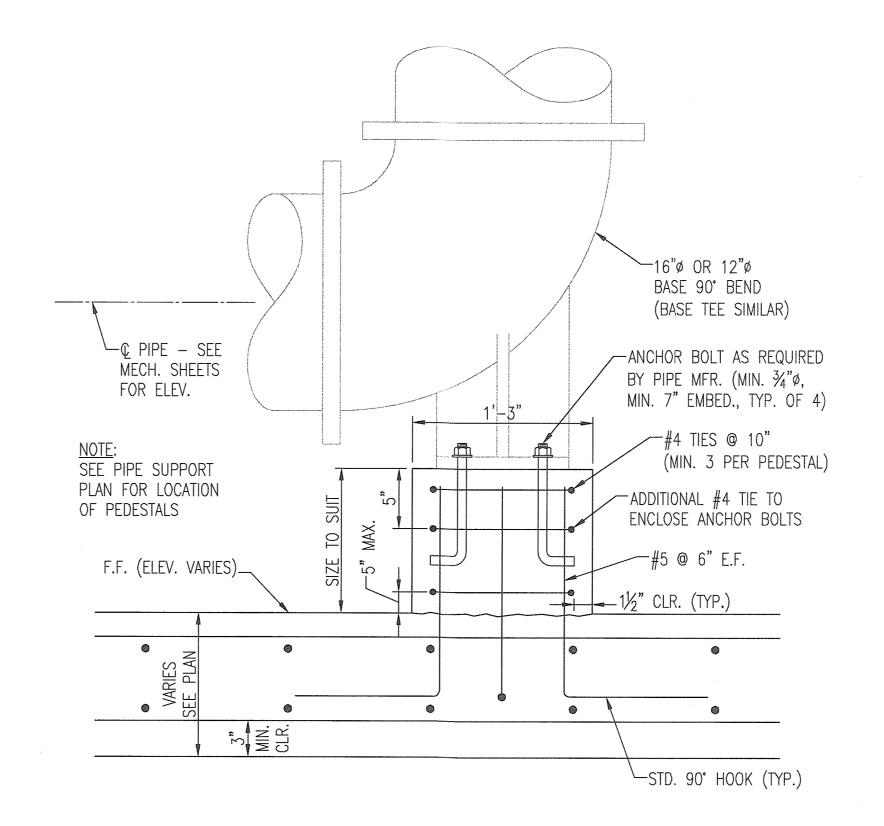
DETAIL: TYPICAL CONCRETE PIPE OR FITTING SUPPORT SADDLE SCALE: NONE
